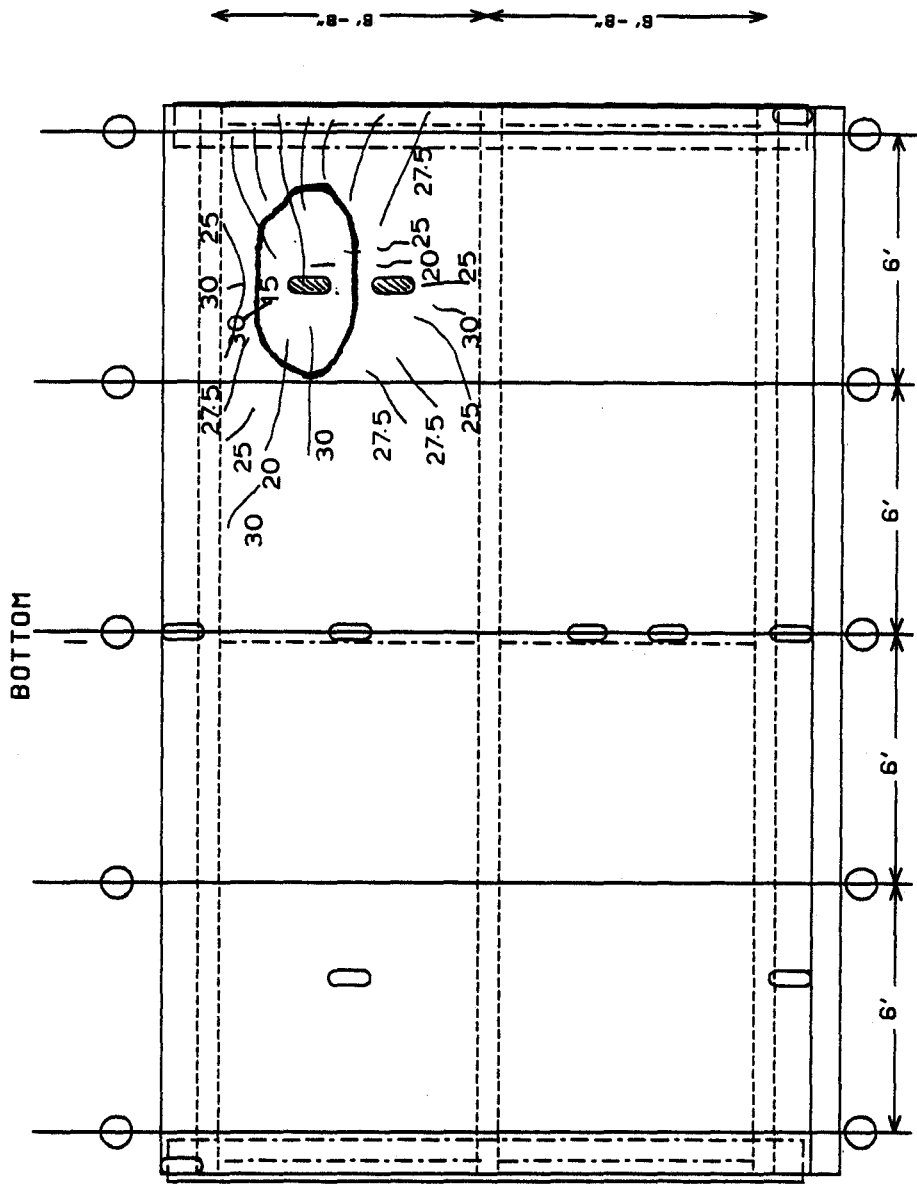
Bottom Cracking Pattern (First Bridge - Test No. 5)
